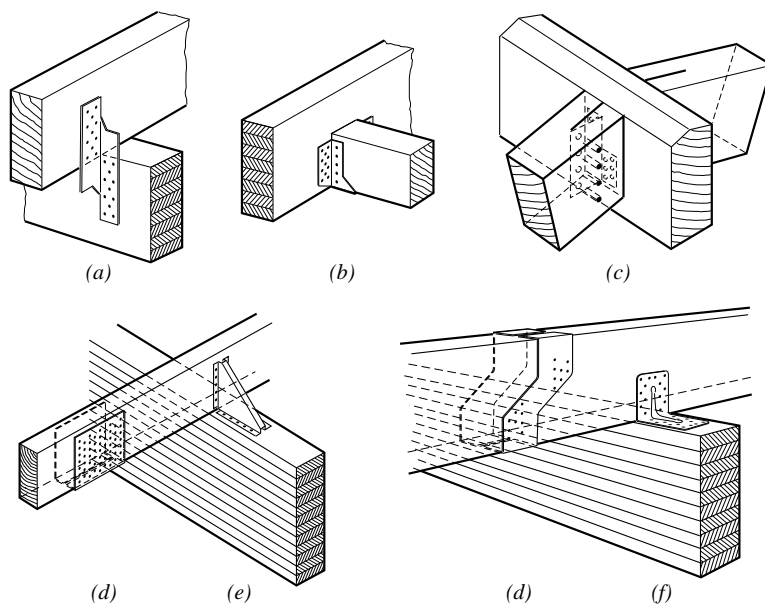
Cold-formed steel connectors. (a) Joist anchor, (b) joist hanger, (c) concealed beam hanger, (d) hinge connector, (e) cleat, (f) angle bracket. (STEP 1995 Article C13)
